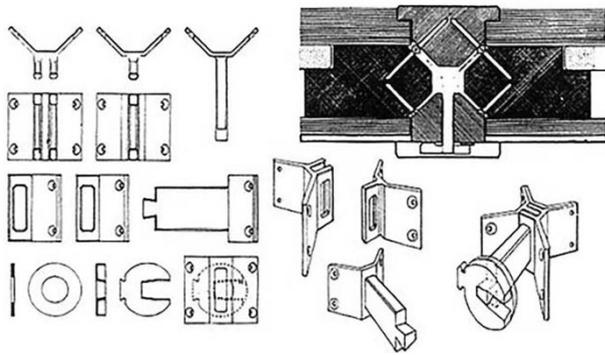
| Konrad Wachsmann and Walter Gropius, Steel connection to fix the panels of the Packaged House System.
